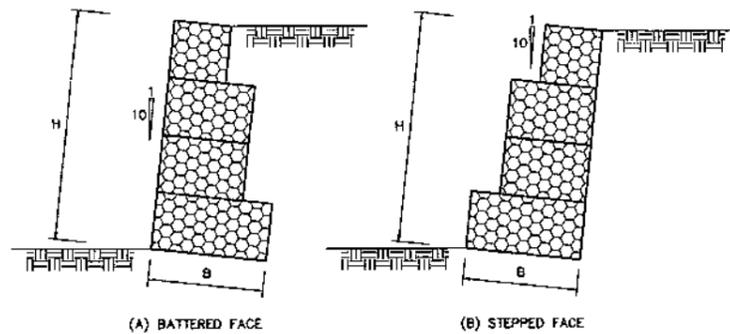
TYPICAL CROSS SECTION OF GABION WALL
